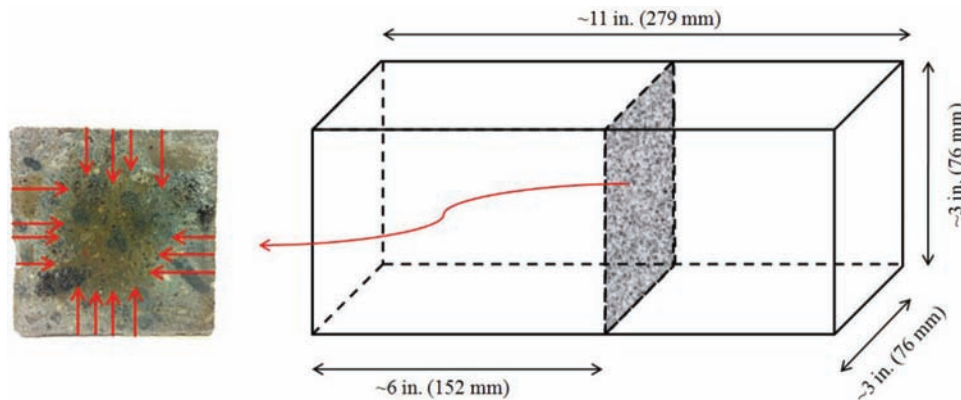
An example of cross section of specimen with its location from the original beam.
